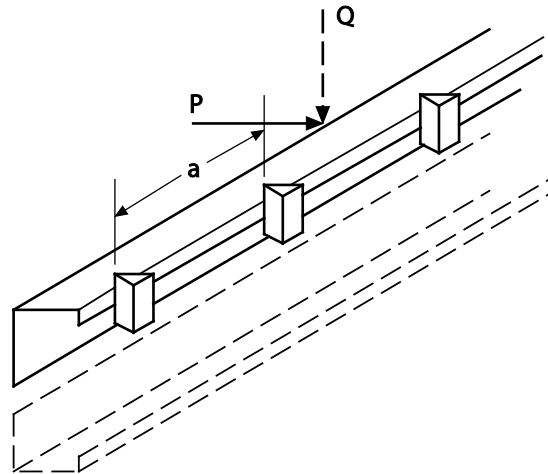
Half of C-Section Treated as a Continuous Beam Loaded by Horizontal Forces
